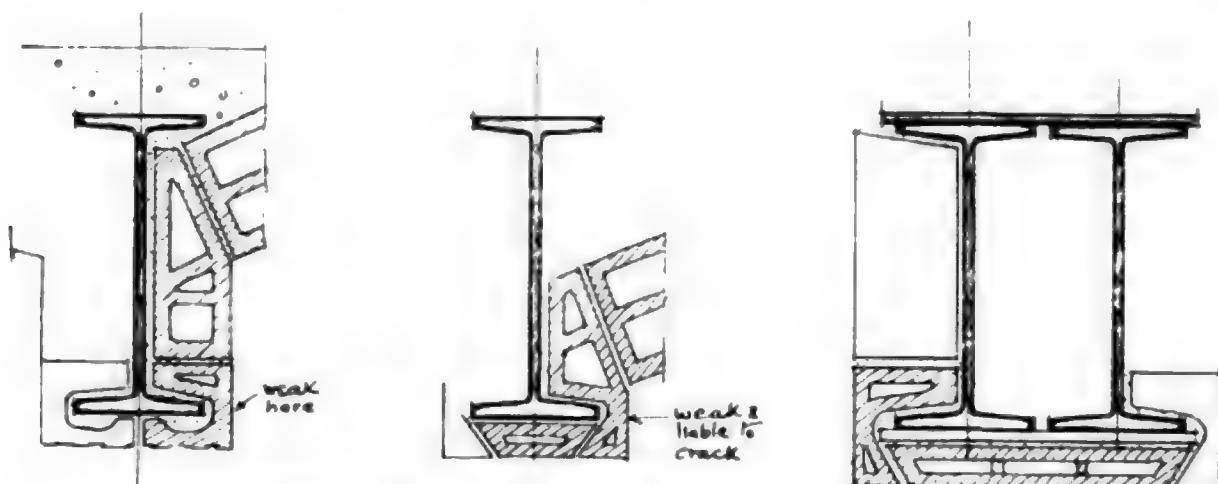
STEEL GIRDER PROTECTED BY TERRA-COTTA TILE. AMERICAN SYSTEM.
